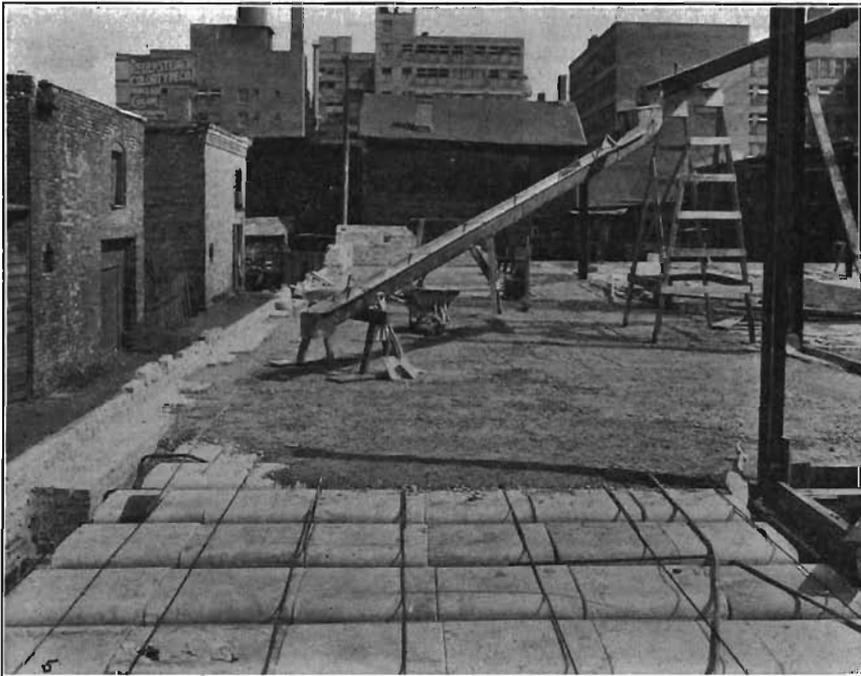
Gypsum floor tile showing conduits, and surfacing of same with concrete. Castle Hotel, Omaha. Courtesy V. G. Marani.
